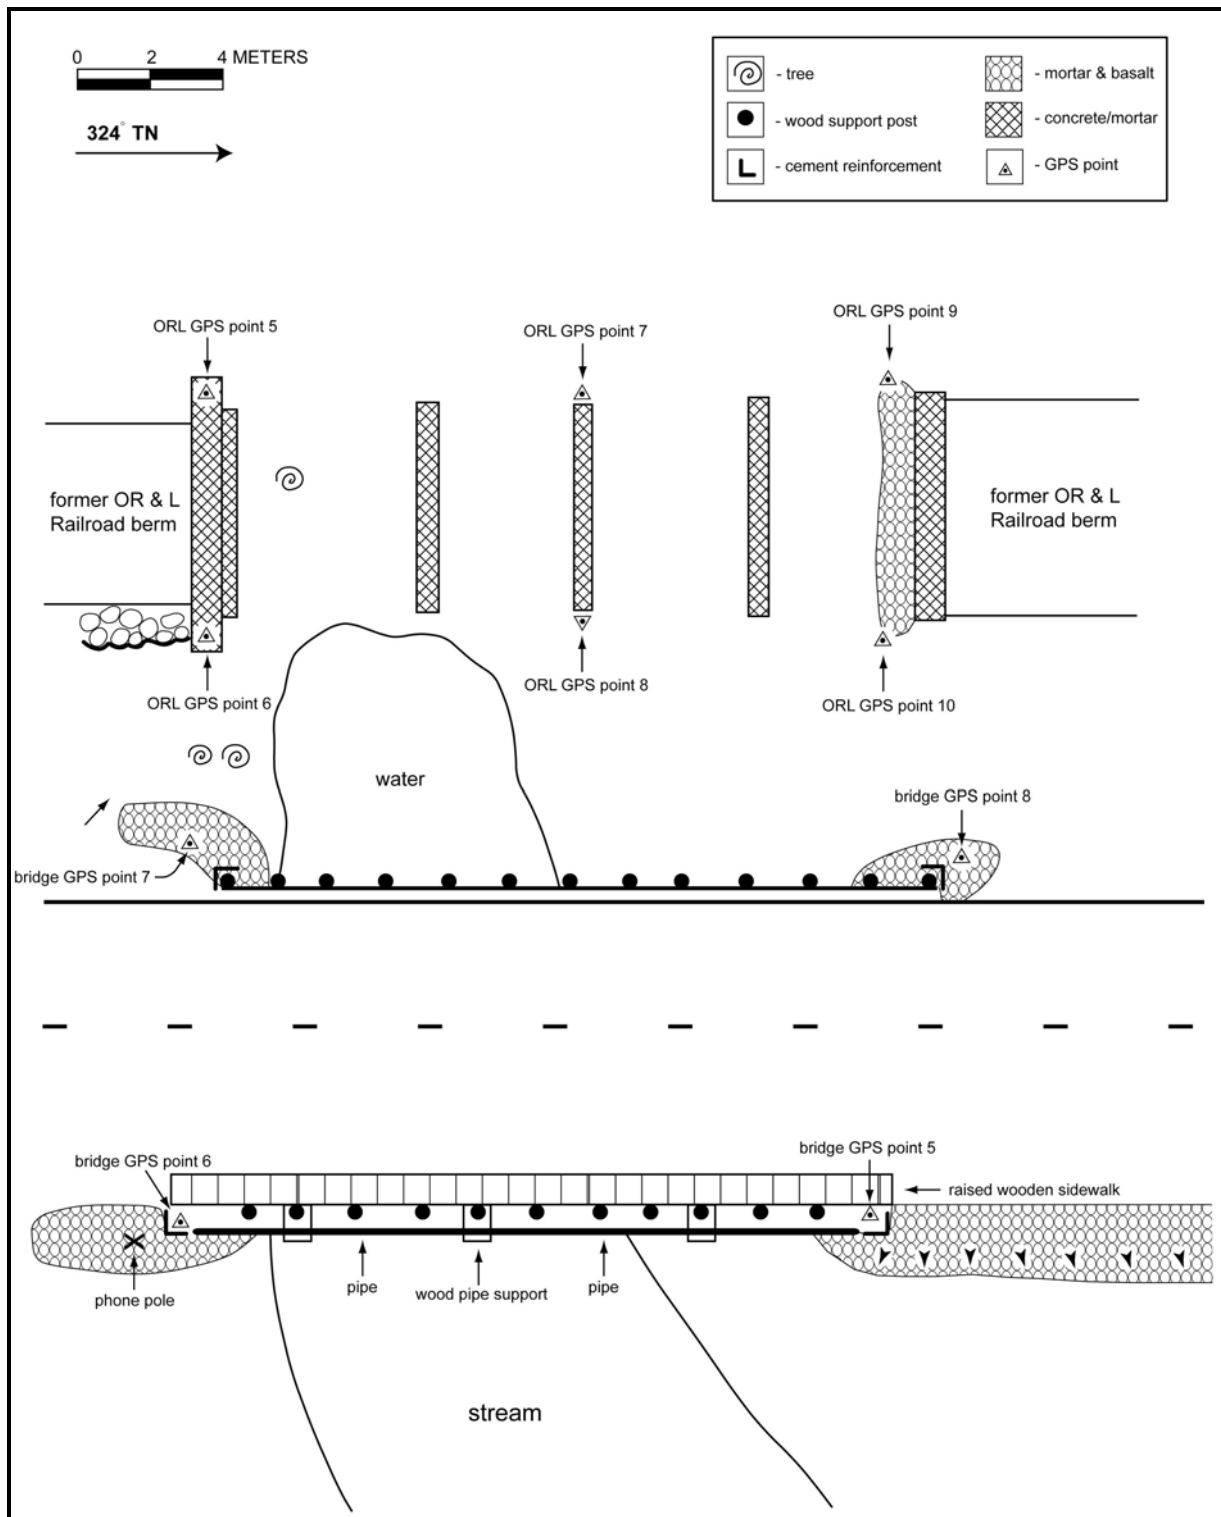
Plan view of SHIP # 50-80-07-6823 (a.k.a. Bridge 3A) and Feature C of SIHP # 50-80-12-9714, remnant of a former O. R. and L. Railroad trestle.
